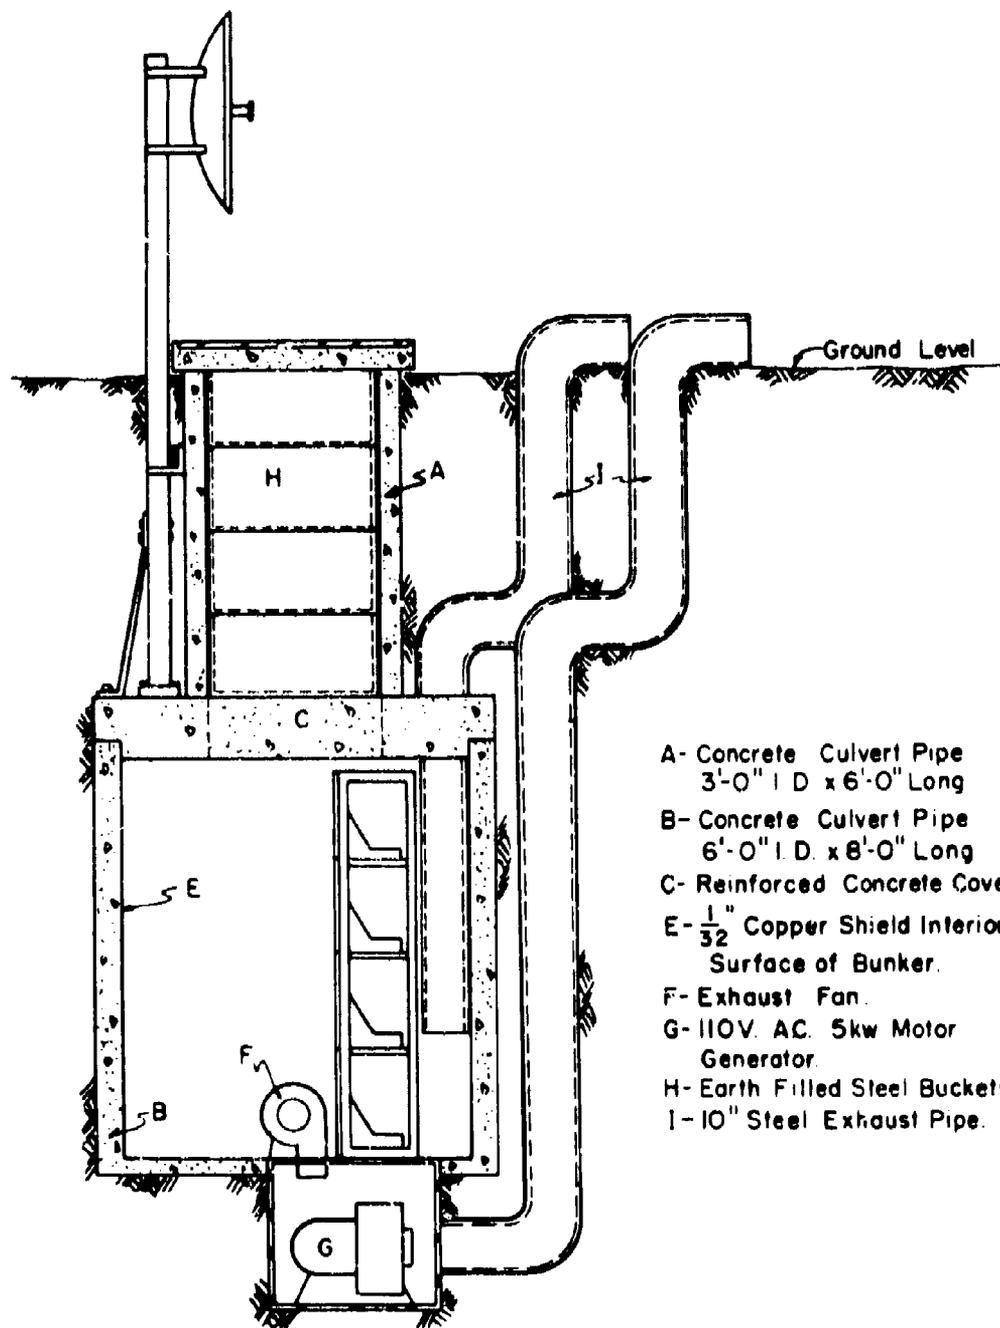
TYPICAL BUNKER INSTALLATION.
